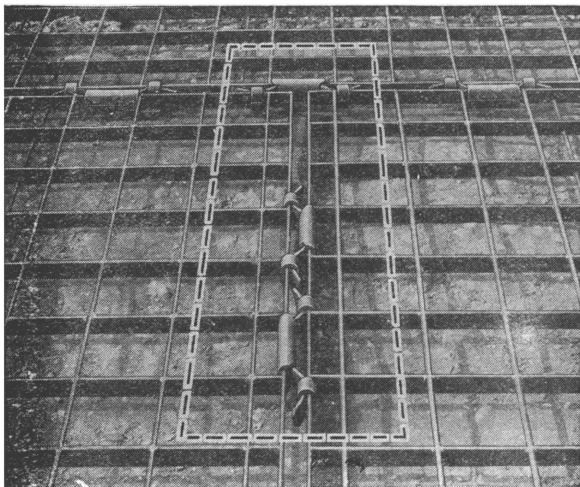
Method of fastening bar-and-rod steel plank. (Similar connection used with Irving grid.)
